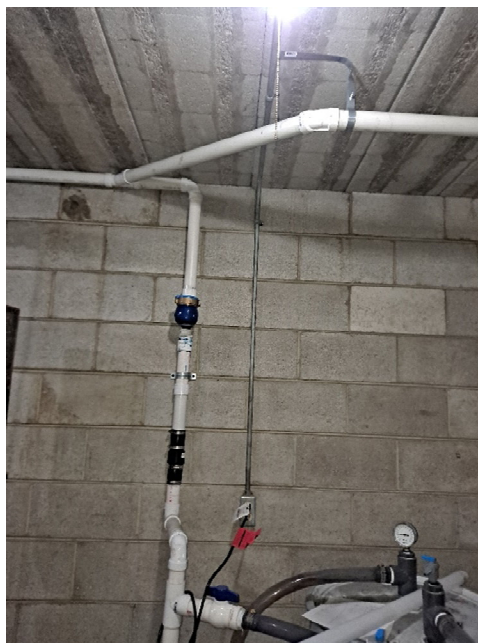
PVC PIPING CONNECTING TO SUMP 3 PVC PIPING
